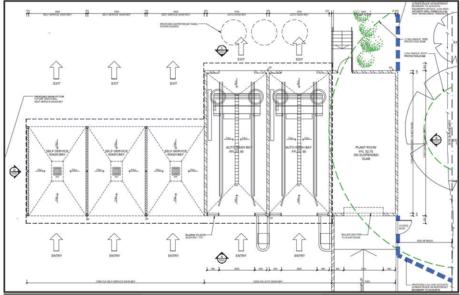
Floor plan of new car wash (Source: MCHP Architects, Drawing No. 19-085 DA02 Rev B)
